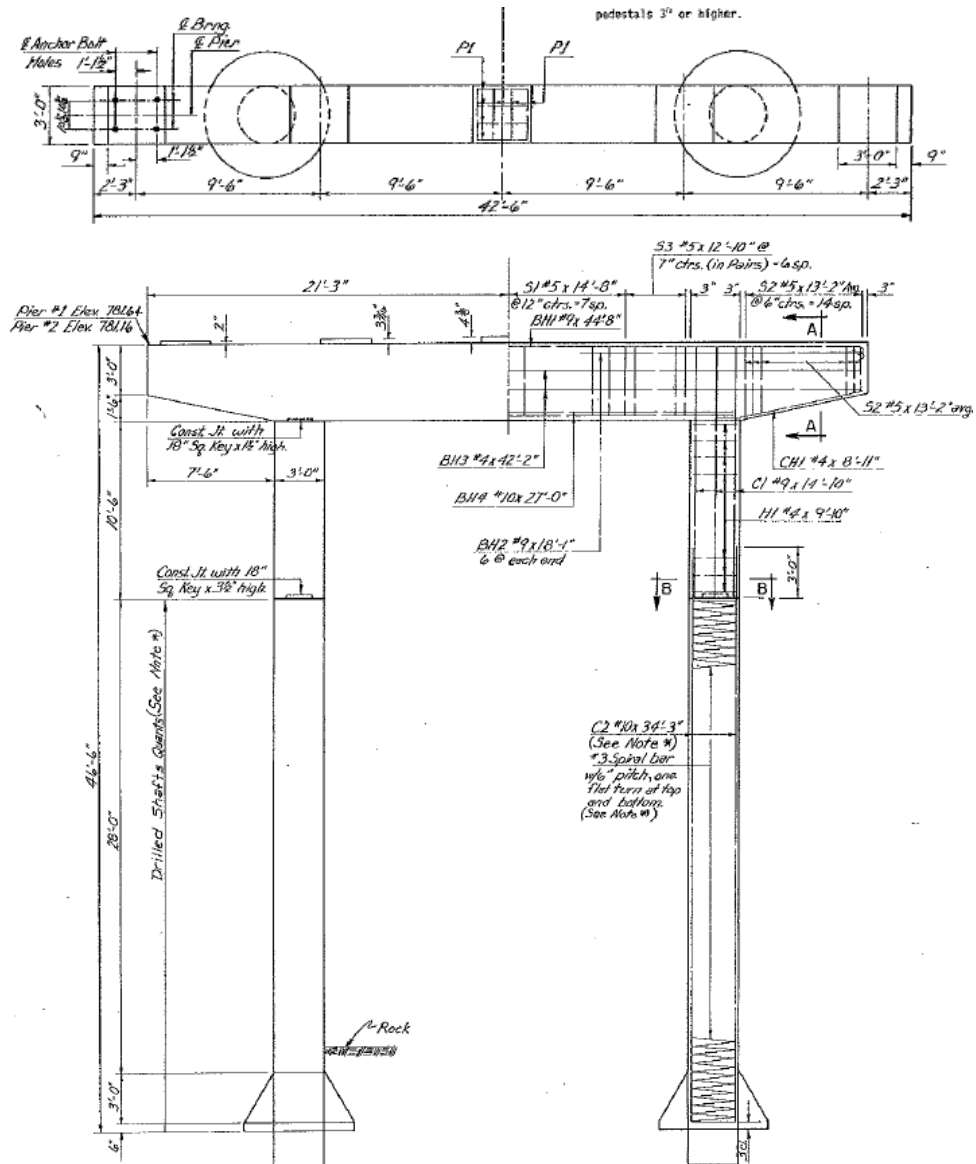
Plan and elevation of multi-column bent. Taken from FAS Project No. R.S. 1910(103) plans.
